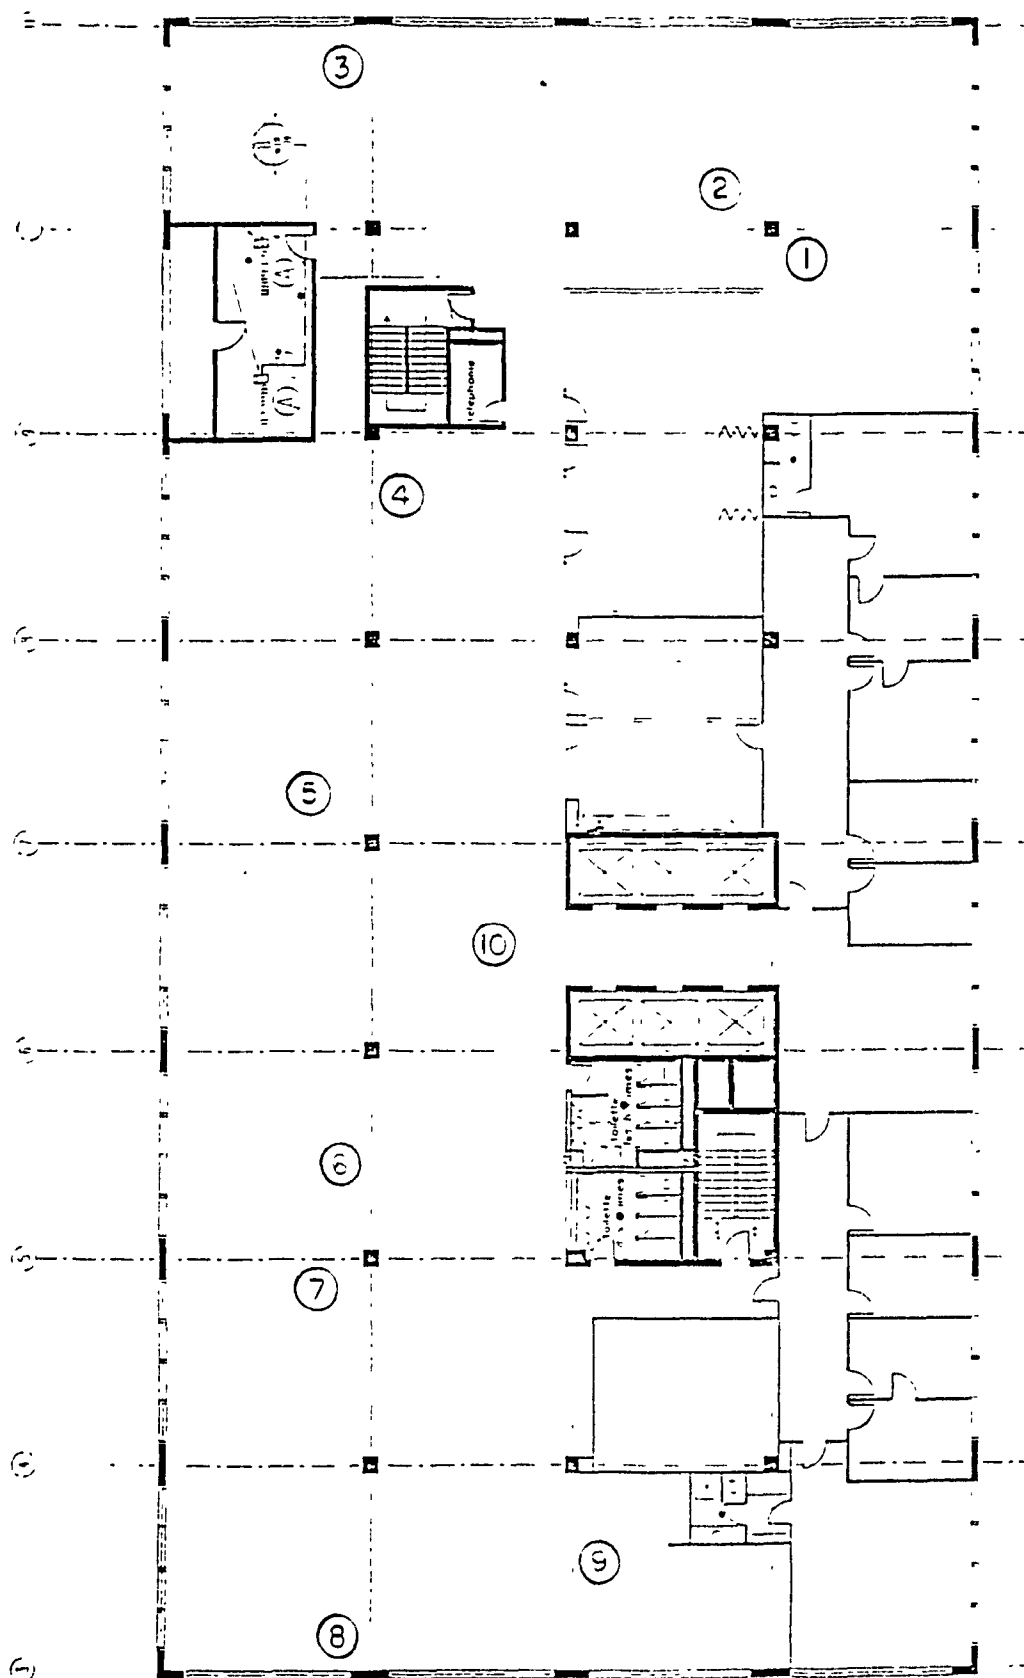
Sampling stations (from 1 to 10) of one floor
